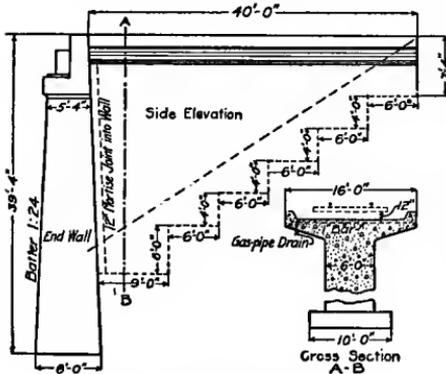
REINFORCED-CONCRETE T ABUTMENT.
